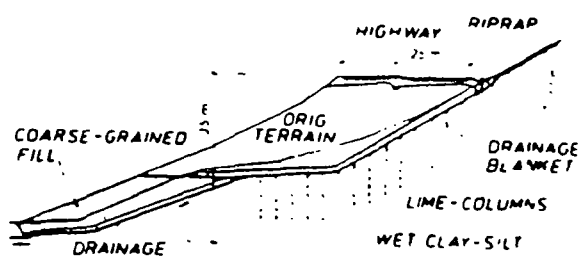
Slope Stabilization Using Lime Columns and Drainage
